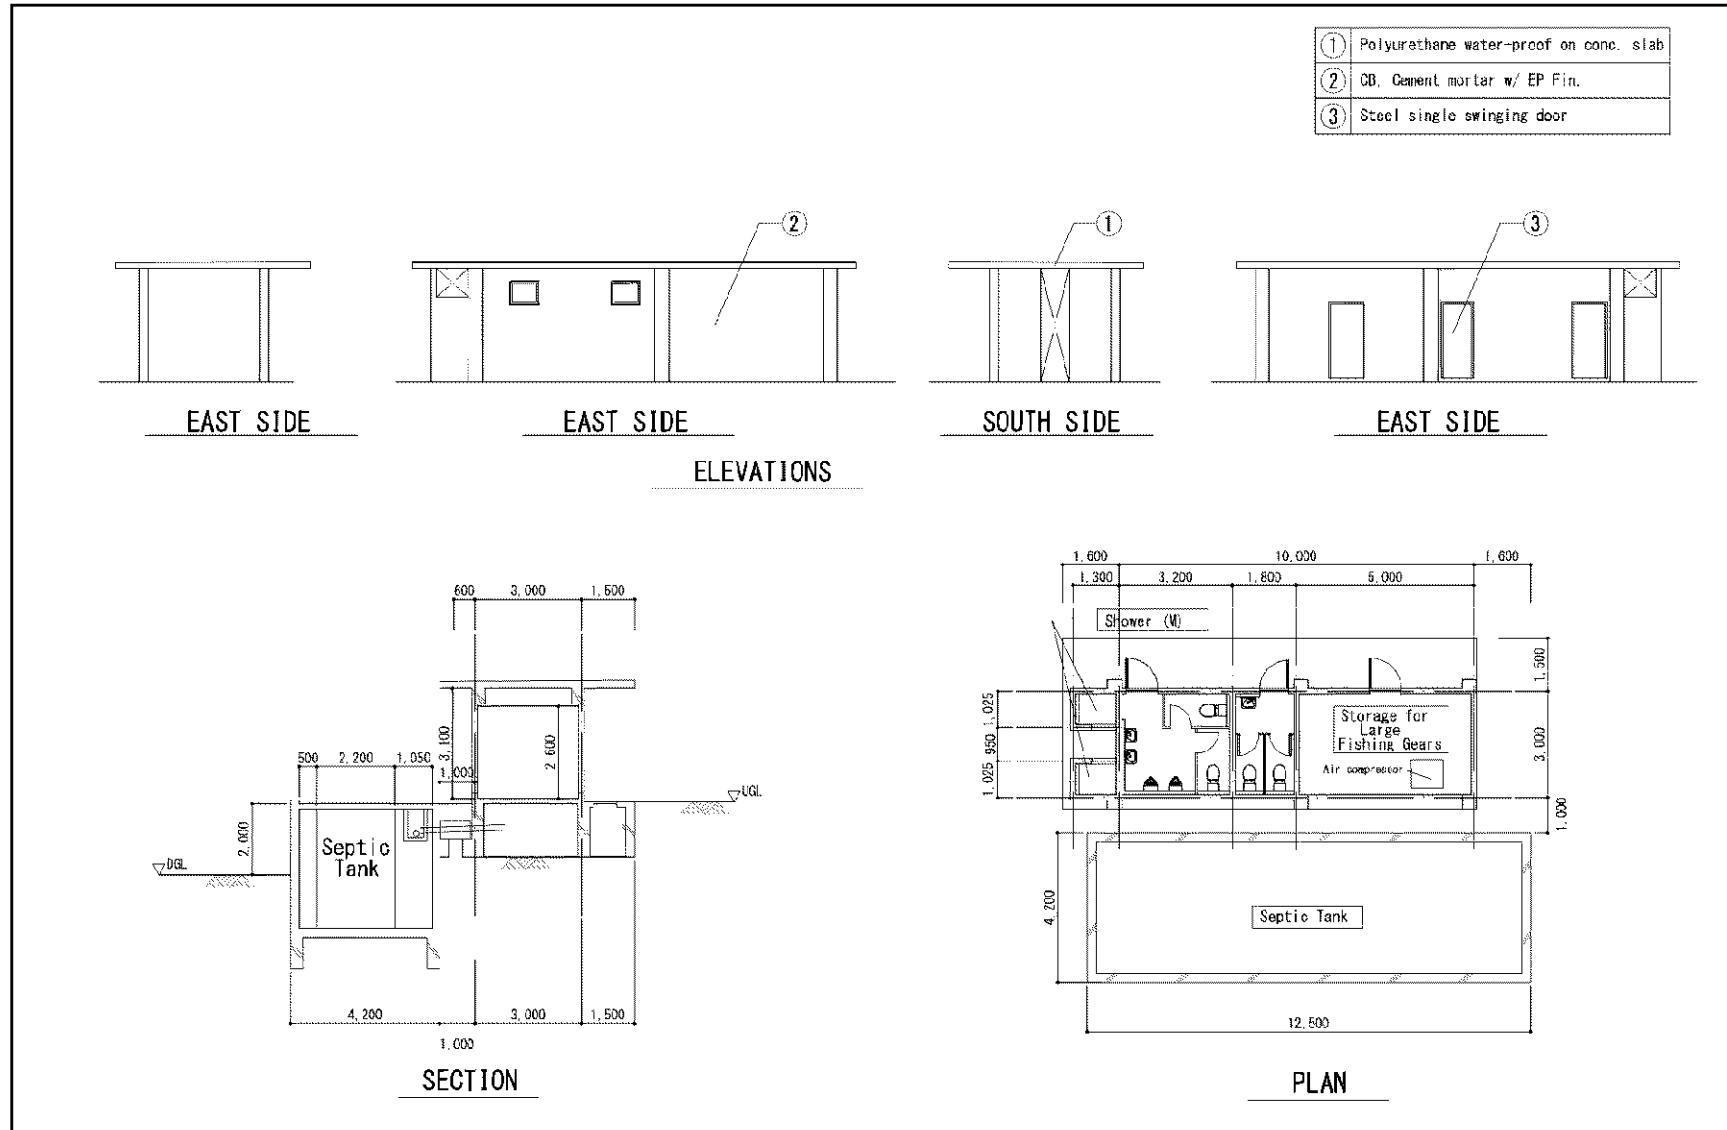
(12) Storage for Large Fishing Gears and Toilet (Plan, View and Cross Section)
